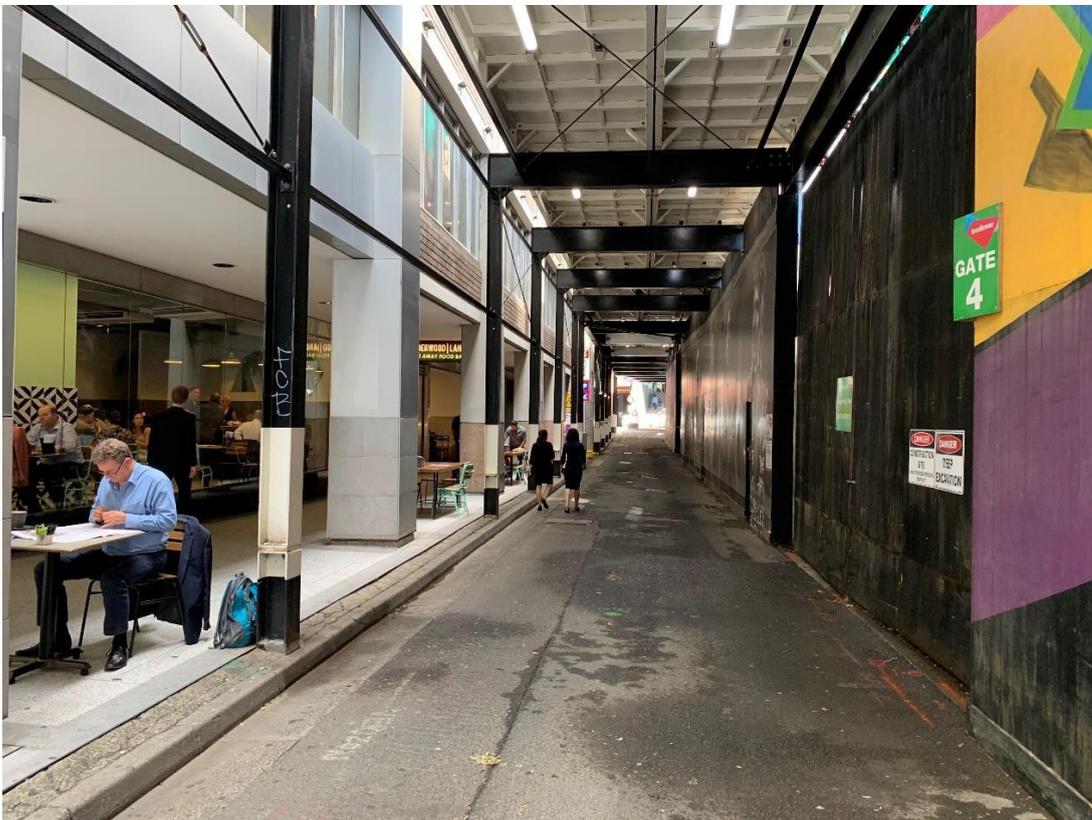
Looking south along Underwood Street towards the Telstra exchange building and colonnade
